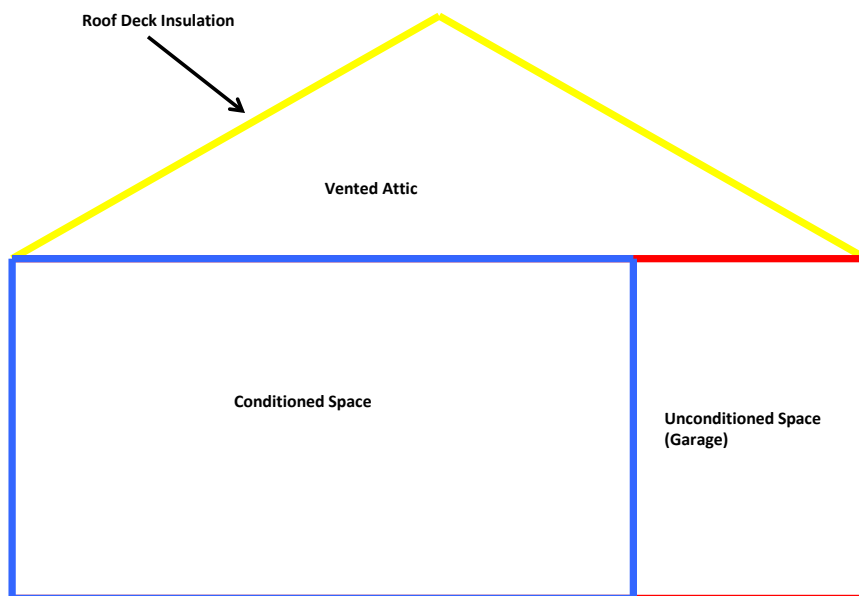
House with attic insulation extending over conditioned and unconditioned spaces
